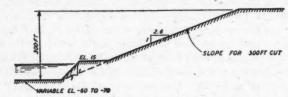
TYPICAL SLOPE BASED ON SLOPE CURVE IN FIG. 68
